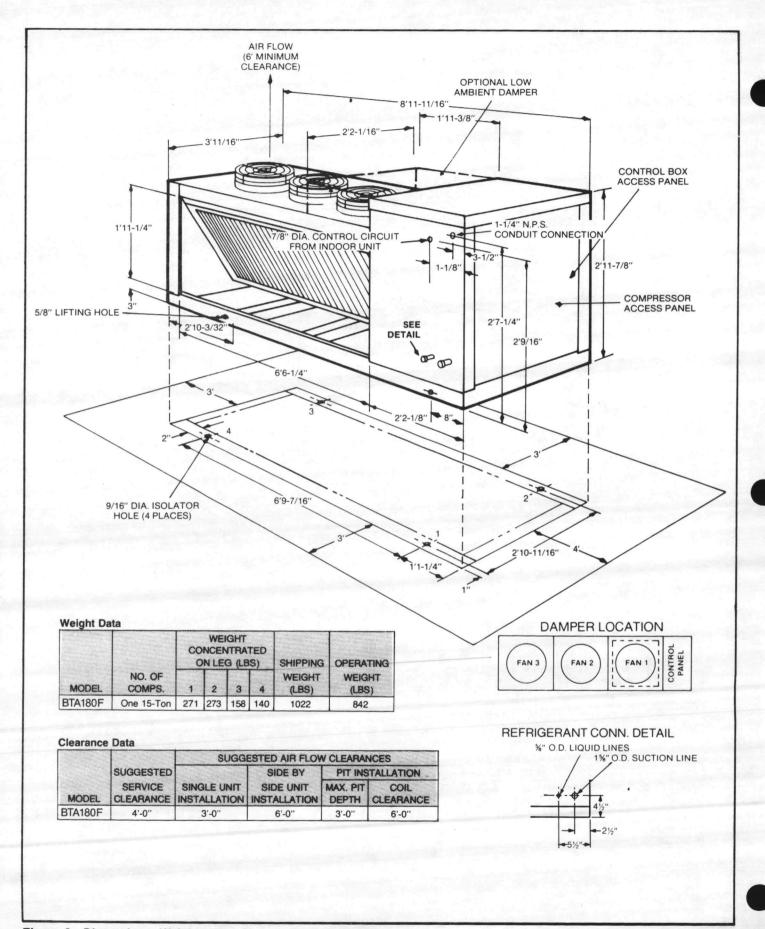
· Dimensions, Weights, and Clearances for BTA180F Units
